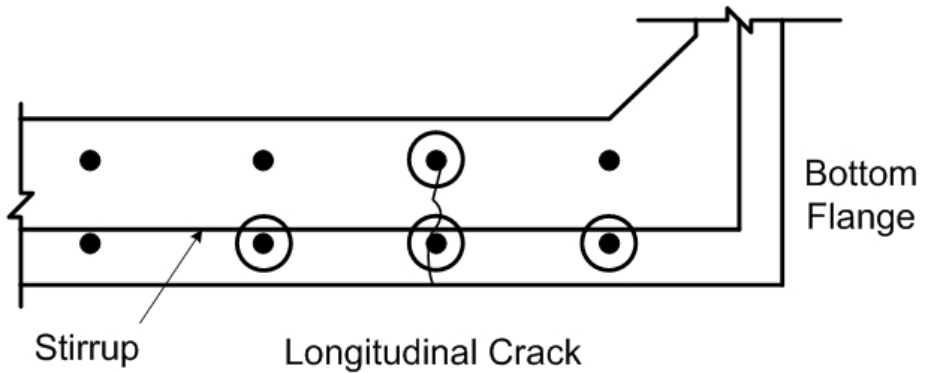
Prestressing Strand Corrosion and Section Loss Caused by Moisture Through Longitudinal Cracking and Shear Reinforcement Bars Transferring Moisture to Adjacent Longitudinal Reinforcement
